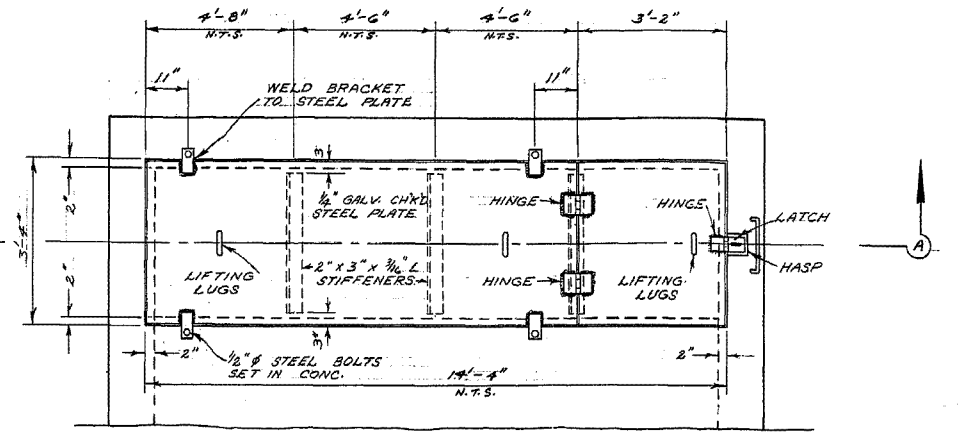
DETAIL OF SAFETY PLATFORM SIPHON OUTLET CHAMBER
